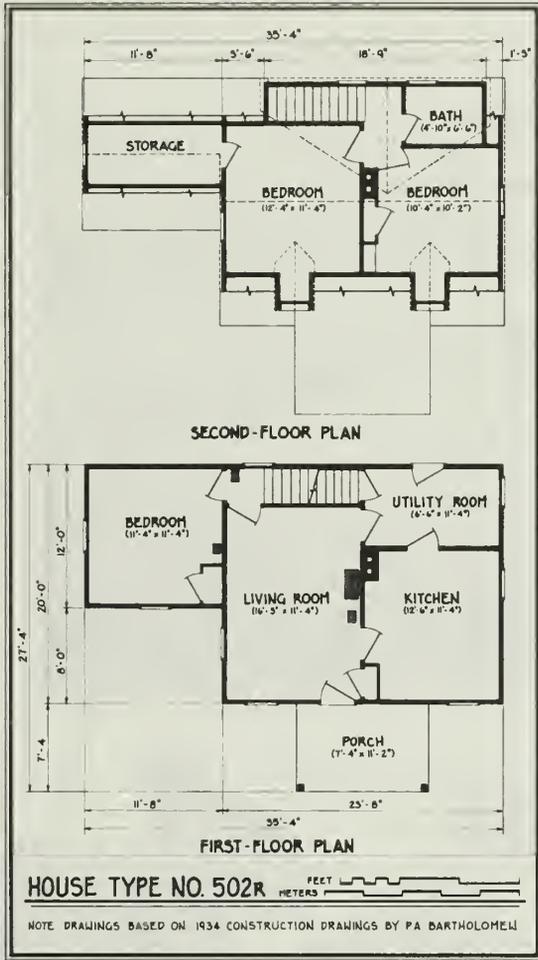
Plans of Type 502R house. Delineator: Isabel C. Yang, HABS.
